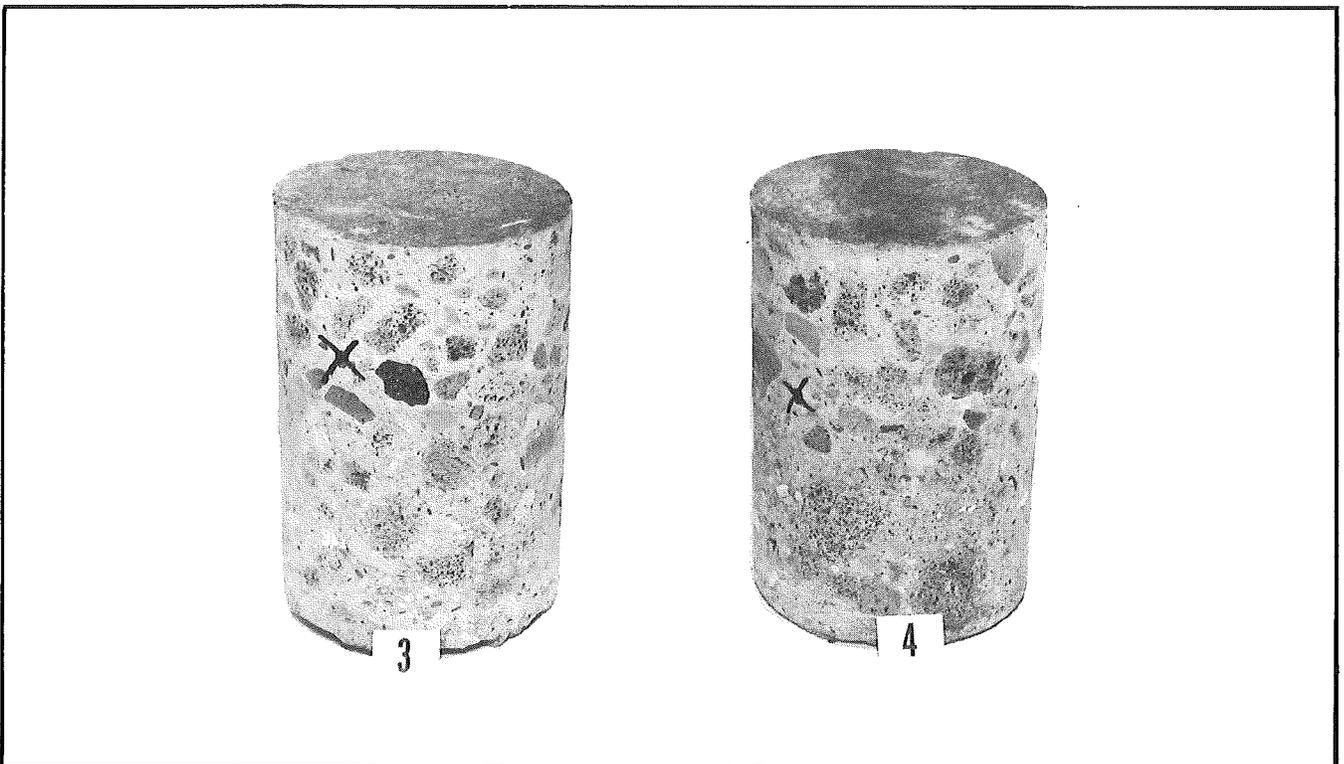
Cores from 1958 reinforced concrete underpass pavement on Belleville Road underpass, in which slag aggregate was used. Locations of reinforcing steel marked by X's.
